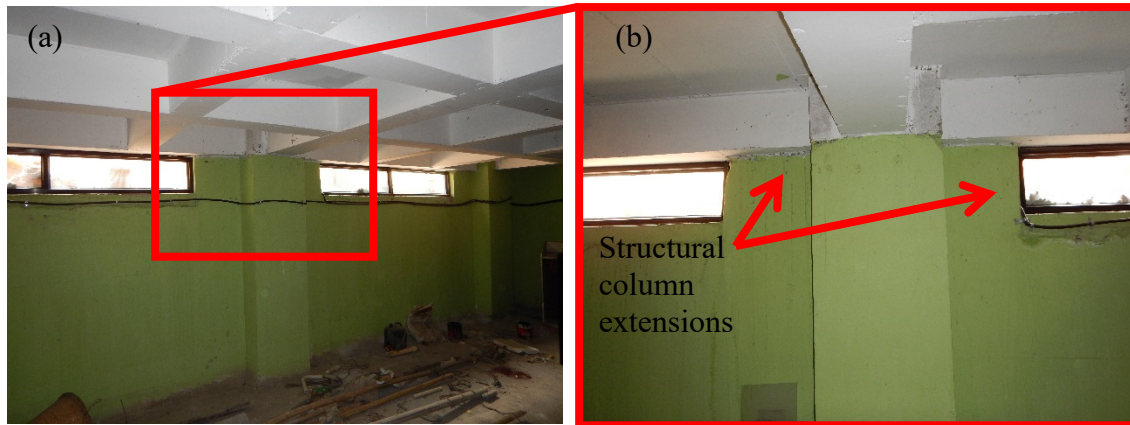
Column extensions at basement clerestory windows to prevent column shear failure in short column region: (a) overall view; (b) close-up view.
